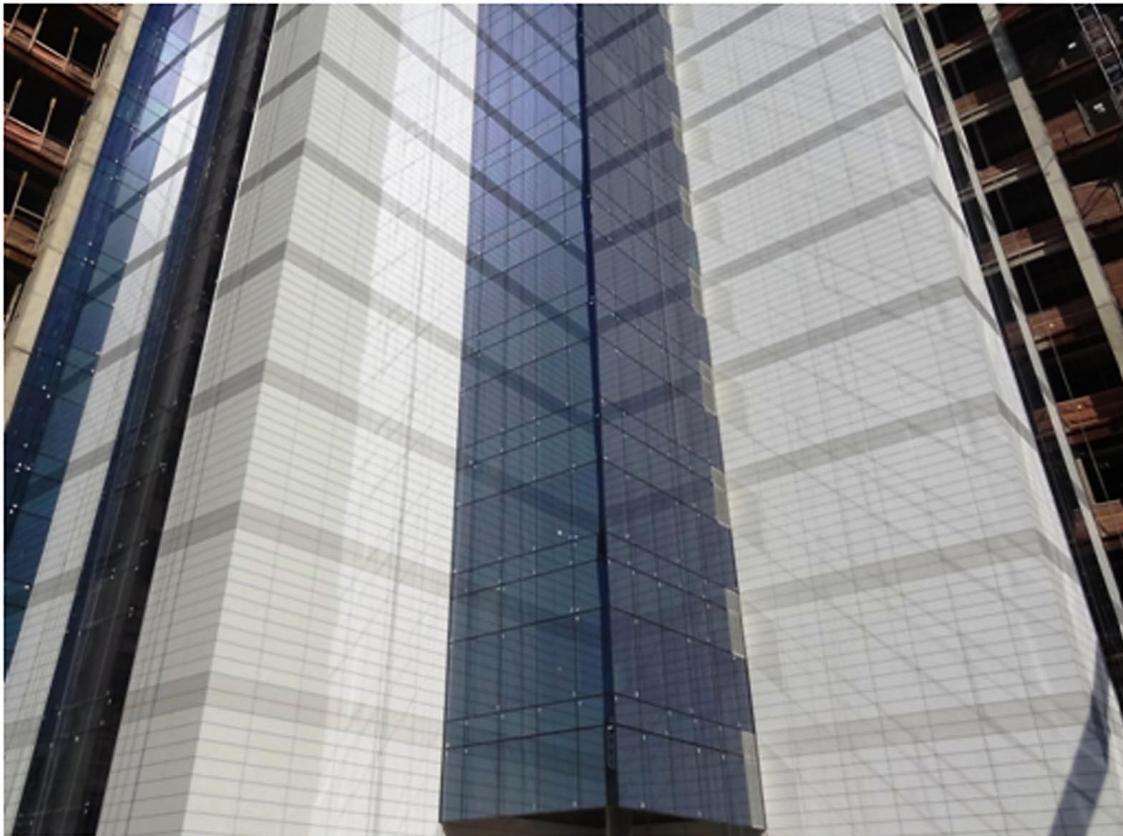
View of building façade under construction: the accuracy of the joints reveals the installation precision.
